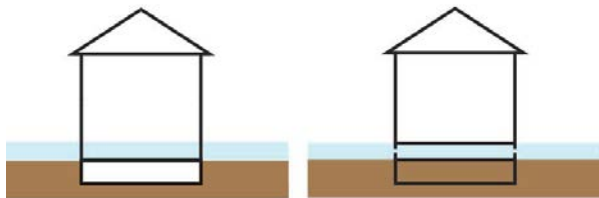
Wet Floodproofing Existing Construction* (NYC Department of Planning 2013a)
